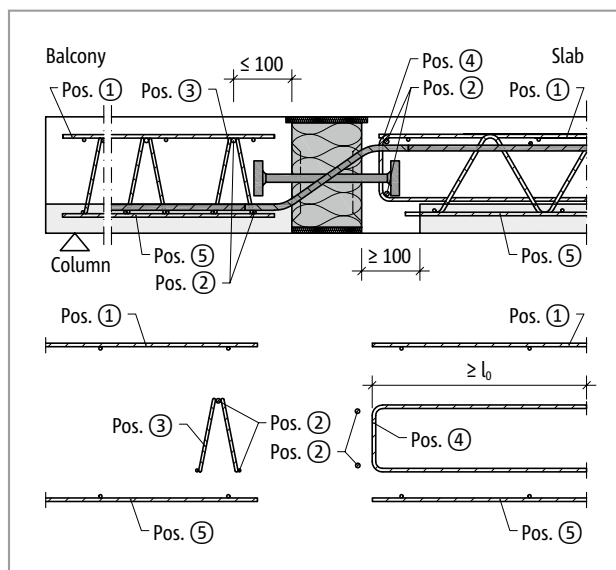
Schöck Isokorb® XT type Q-P: On-site reinforcement with lattice beam
